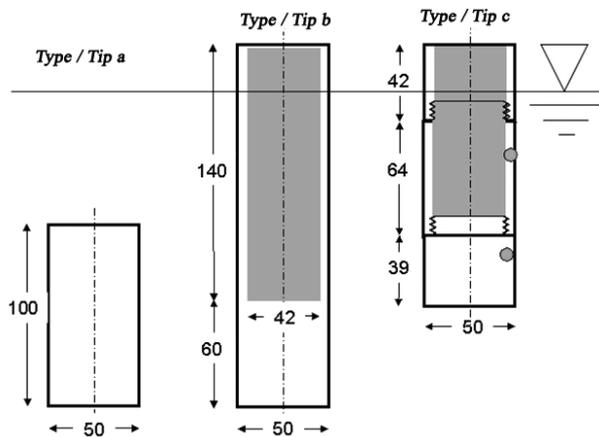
Geometry, dimensions and thermo-couple positions (circles) of the investigated samples
